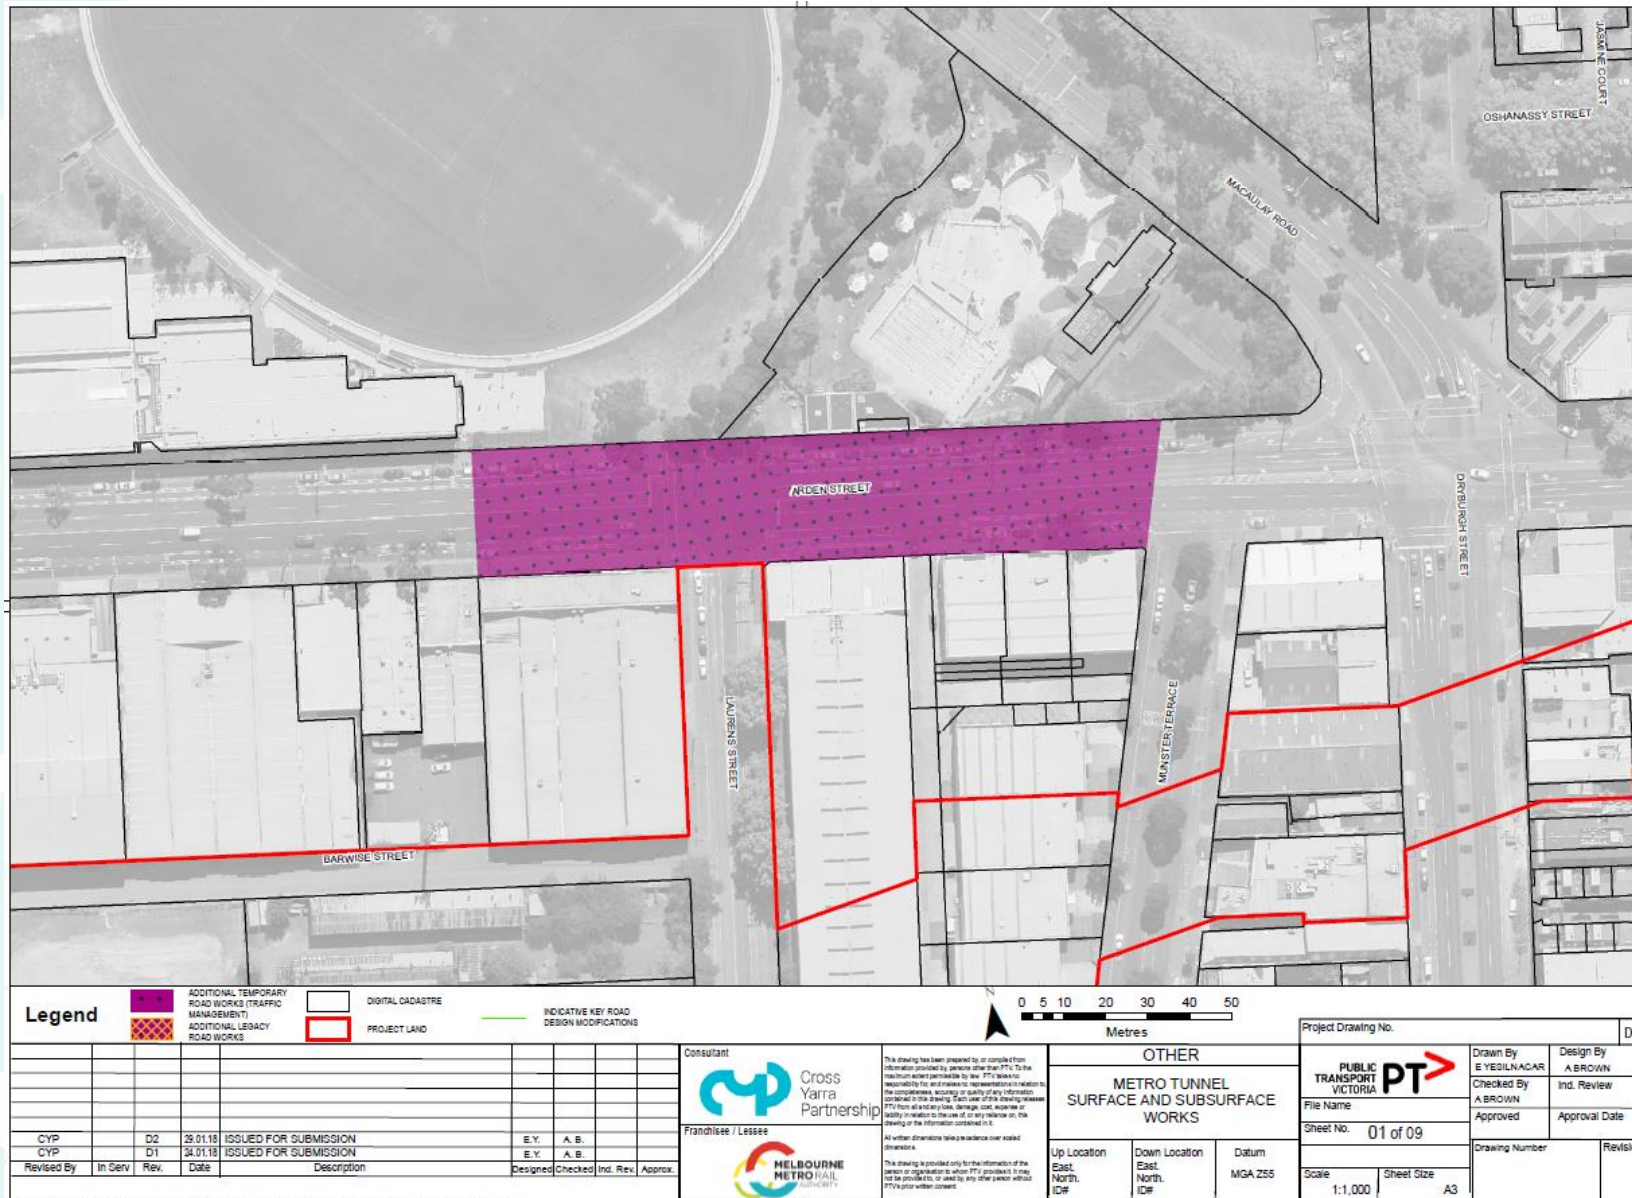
ARDEN STREET ADDITIONAL ROAD SURFACE WORKS
